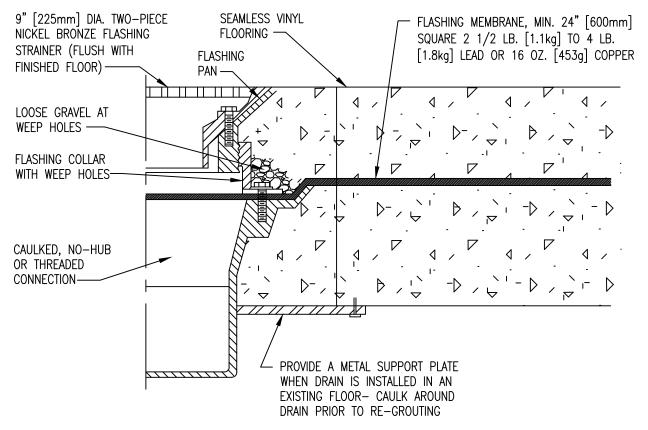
DETAIL TITLE / TYPE "D" FLOOR DRAIN DETAIL
